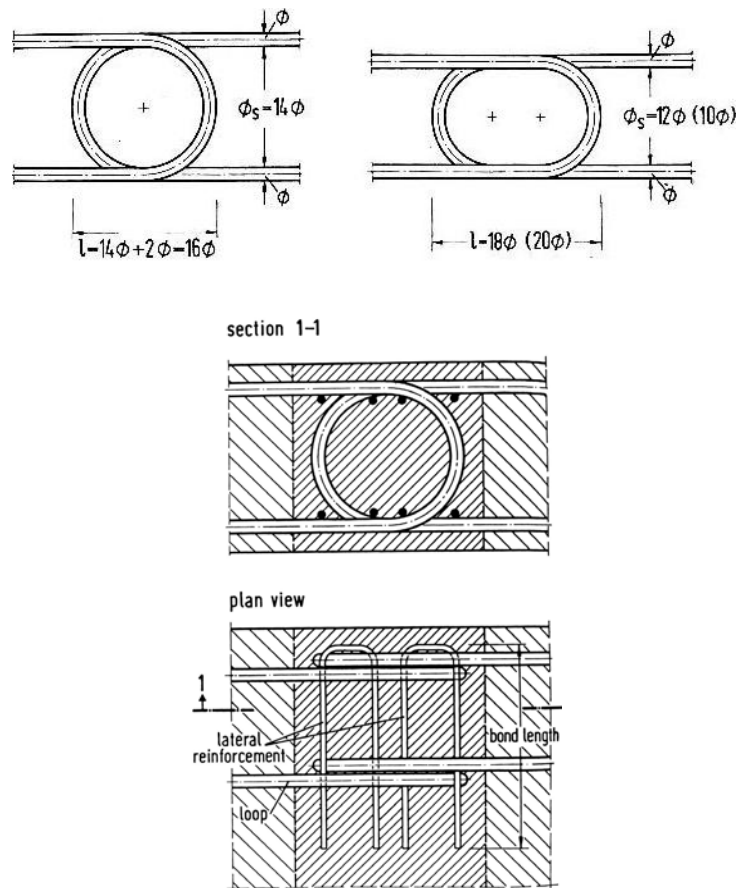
Recommended joint type to connect precast panels (Ref 43)
